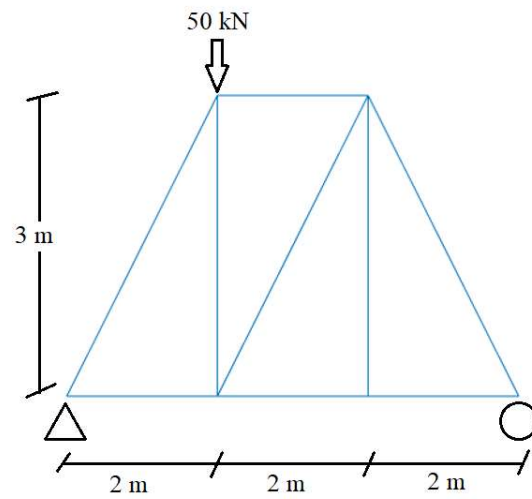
Optimal Truss Structure of Sixteen Elements Truss Subjected to First Load Case
